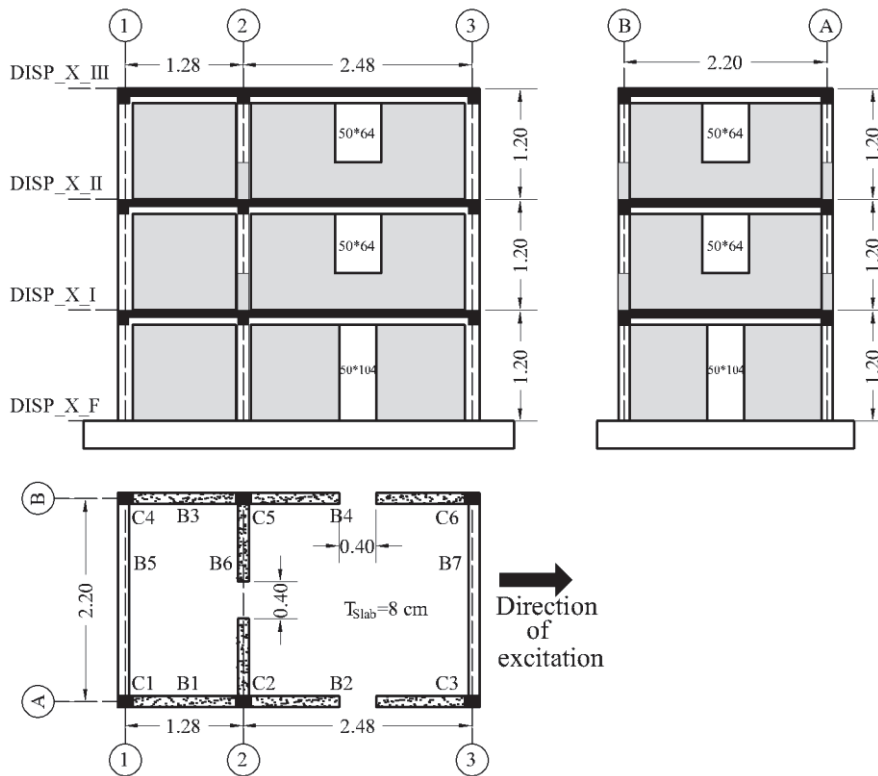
Elevation and plan view of the experimental infilled structure (Sigmund et al., 2014)
